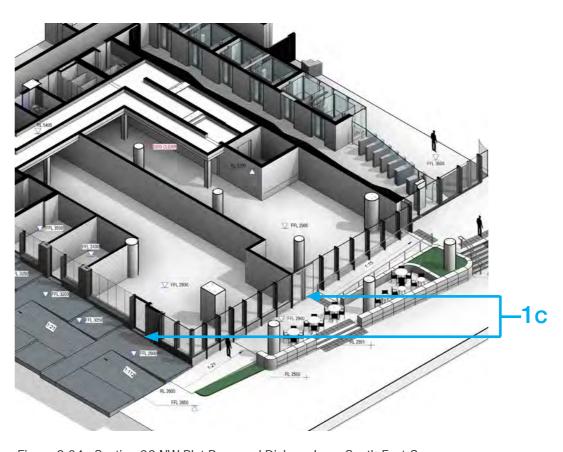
Section 96 NW Plot Proposed Dickson Lane South East Corner
